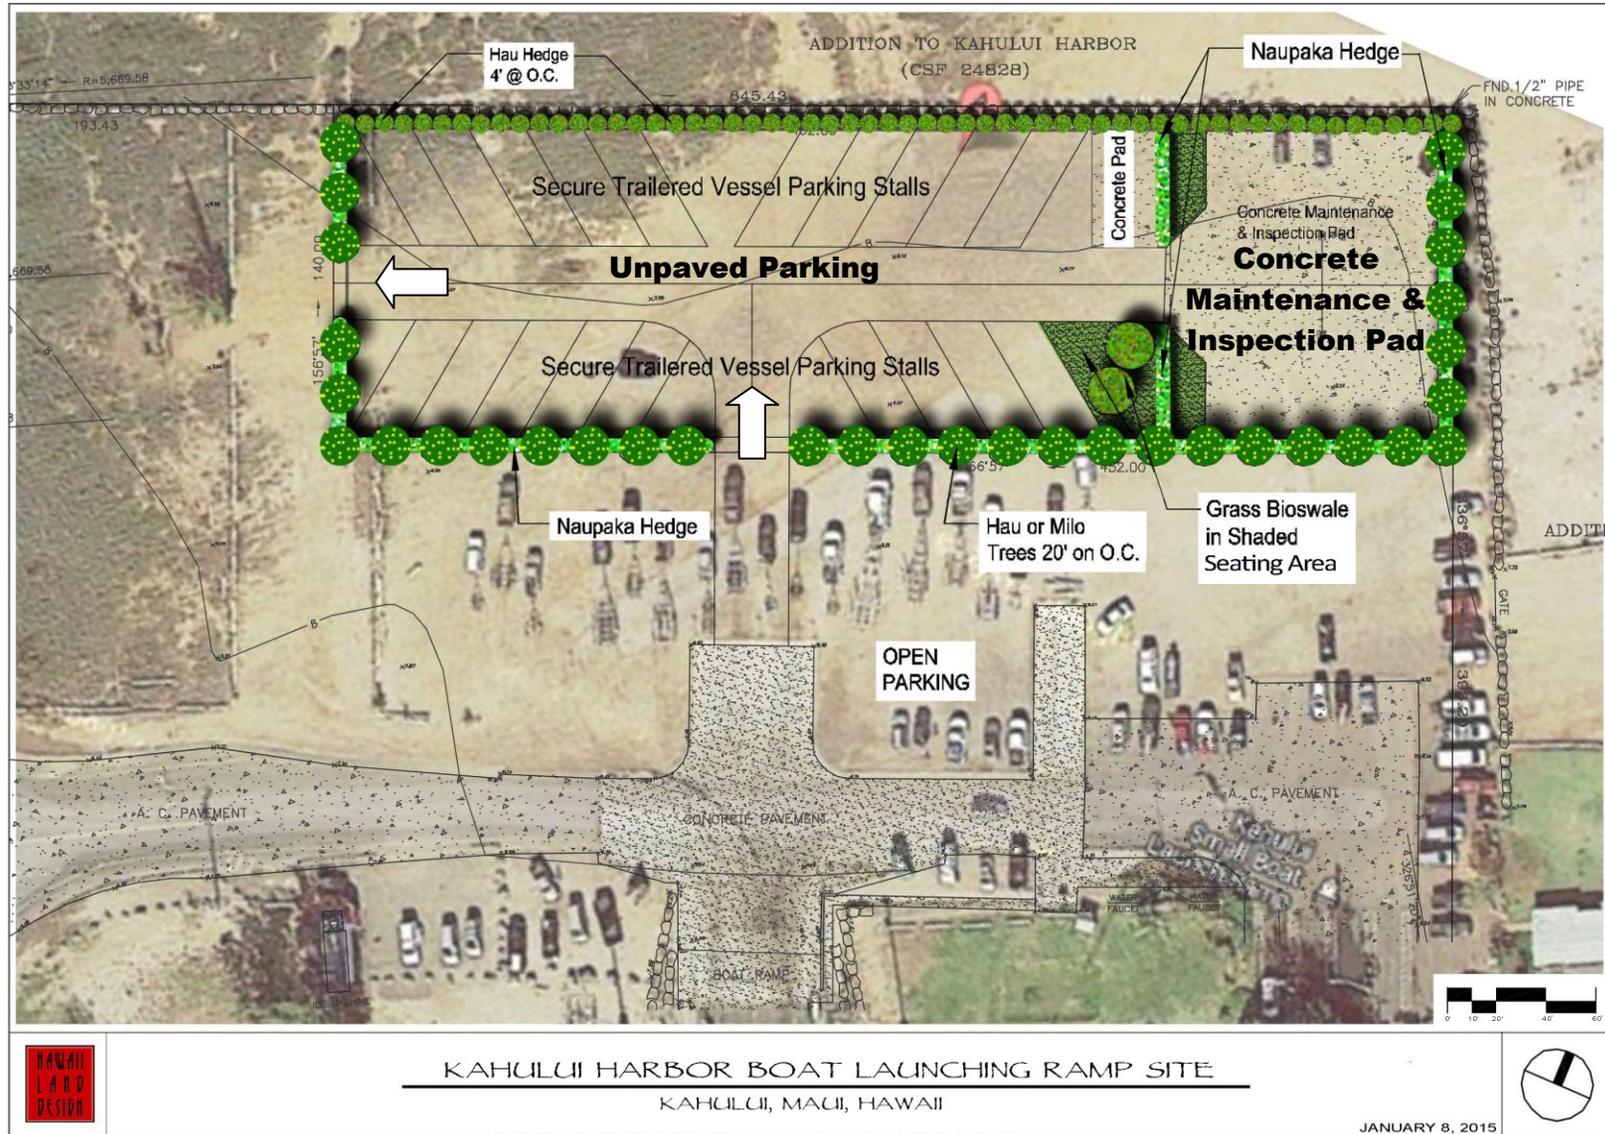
Proposed unpaved enclosed parking, entrance, exit, two inspection pads, and landscaping.
